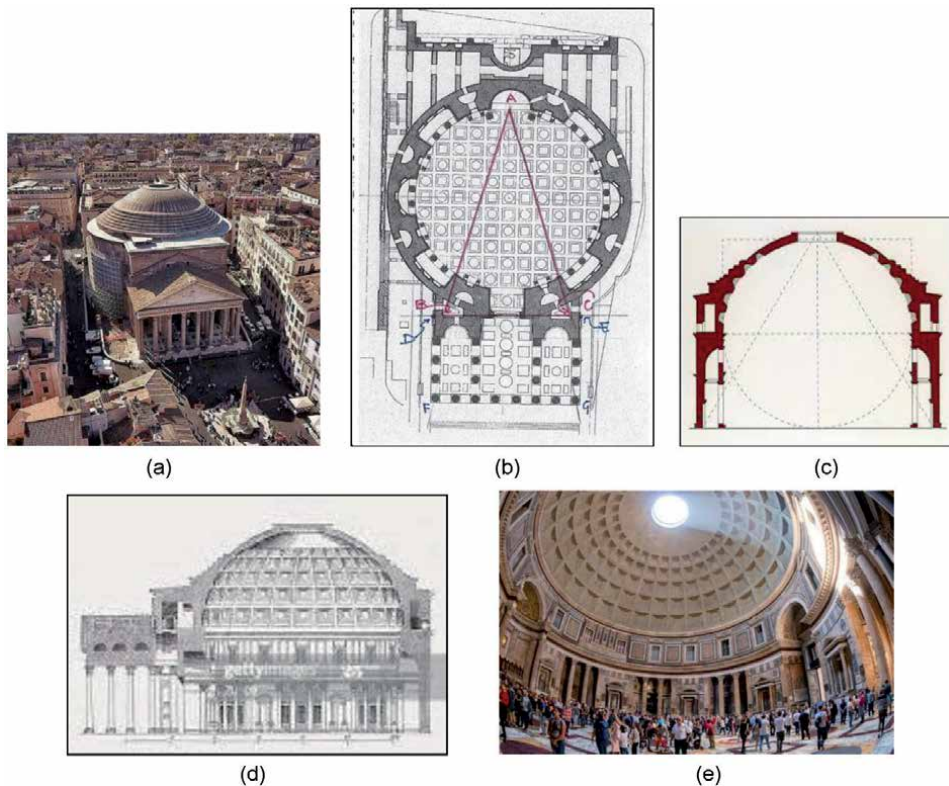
Roma, pantheon: (a) aerial view (photo Pinterest); (b) ground floor of rotunda and so-called portico (Wikimedia & author); (c) transversal section (Pinterest); (d) longitudinal section (Getty images); (e) general view rotunda inside (Wikimedia).
